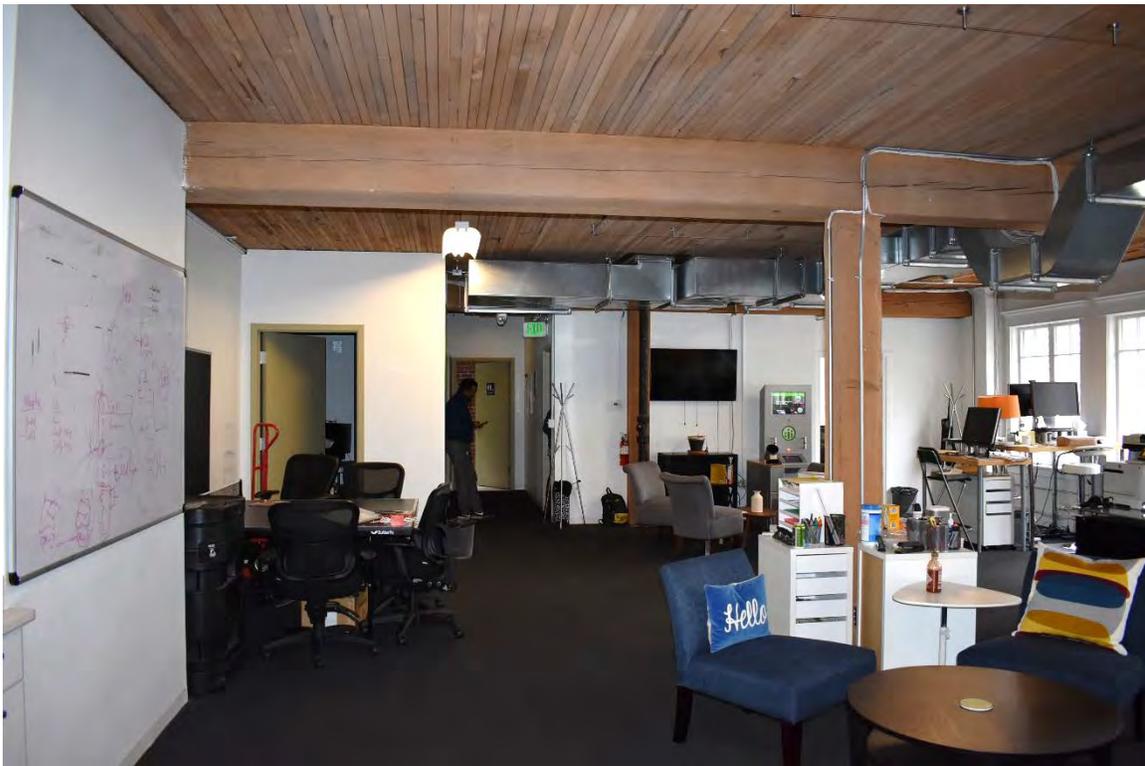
Interior, second floor office, kitchen area, actual ceiling height above kitchen
